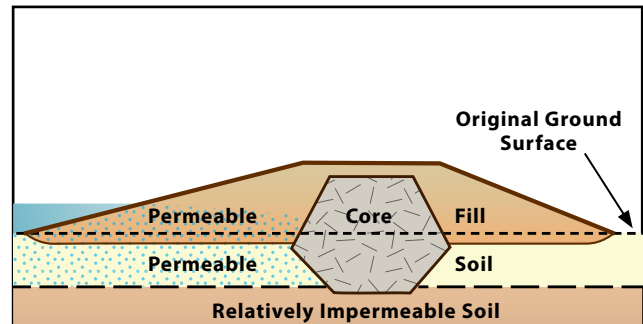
Embankment Section with a Core or Zoned Fill
